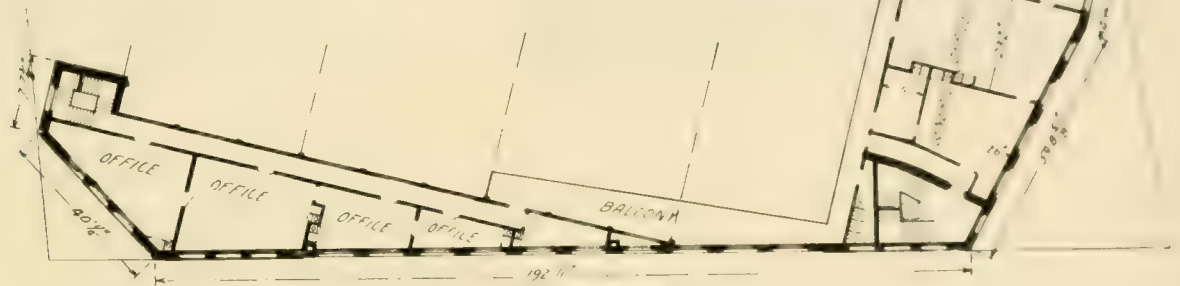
THIRD FLOOR OF STATION BUILDING.
